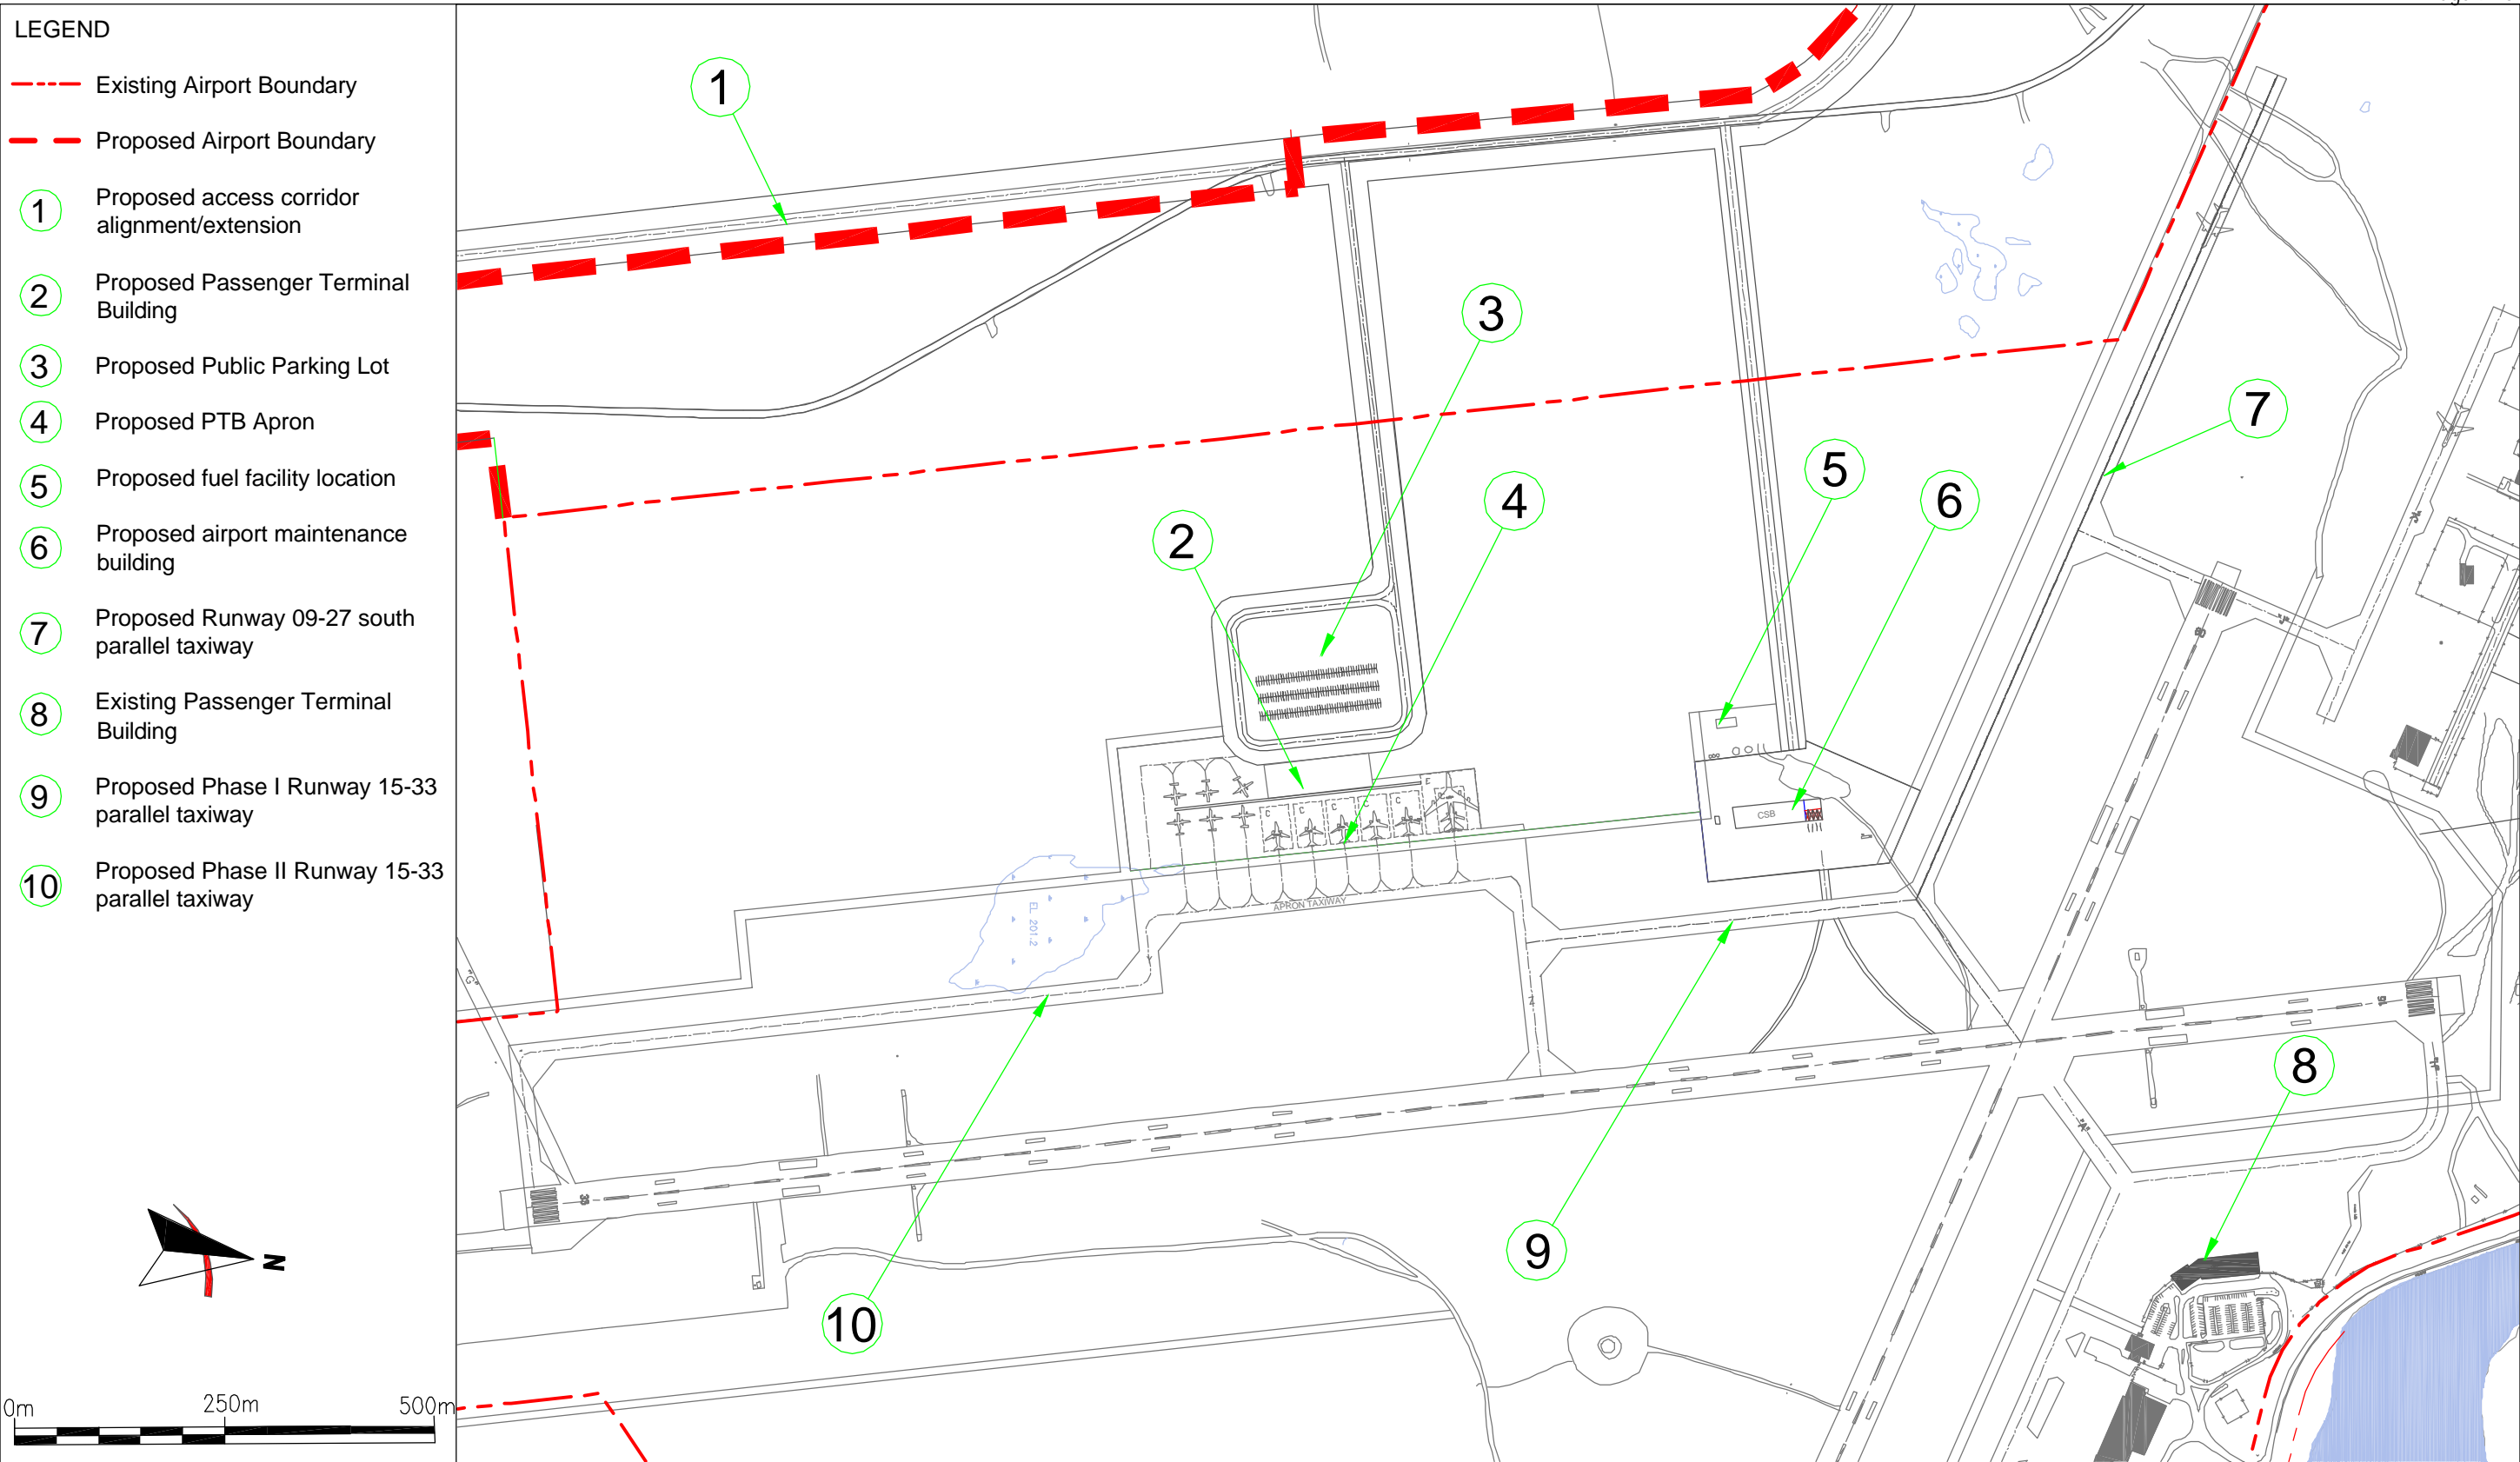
Preliminary Site and Facility Concept Layout - Future PTB
